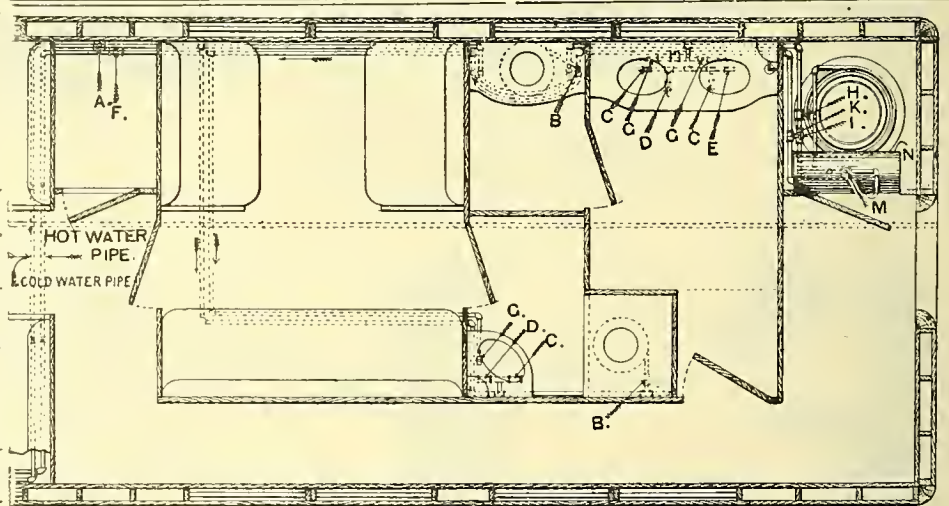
Part Sectional Plan, showing Piping and Connection between Air-tank, Heater, Storage Tank and Lavatories.
